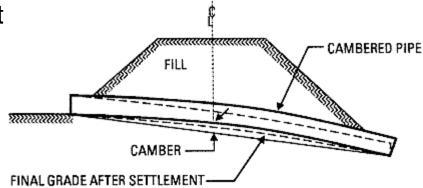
Camber in Pipe to Allow for Settlement under High Fill
